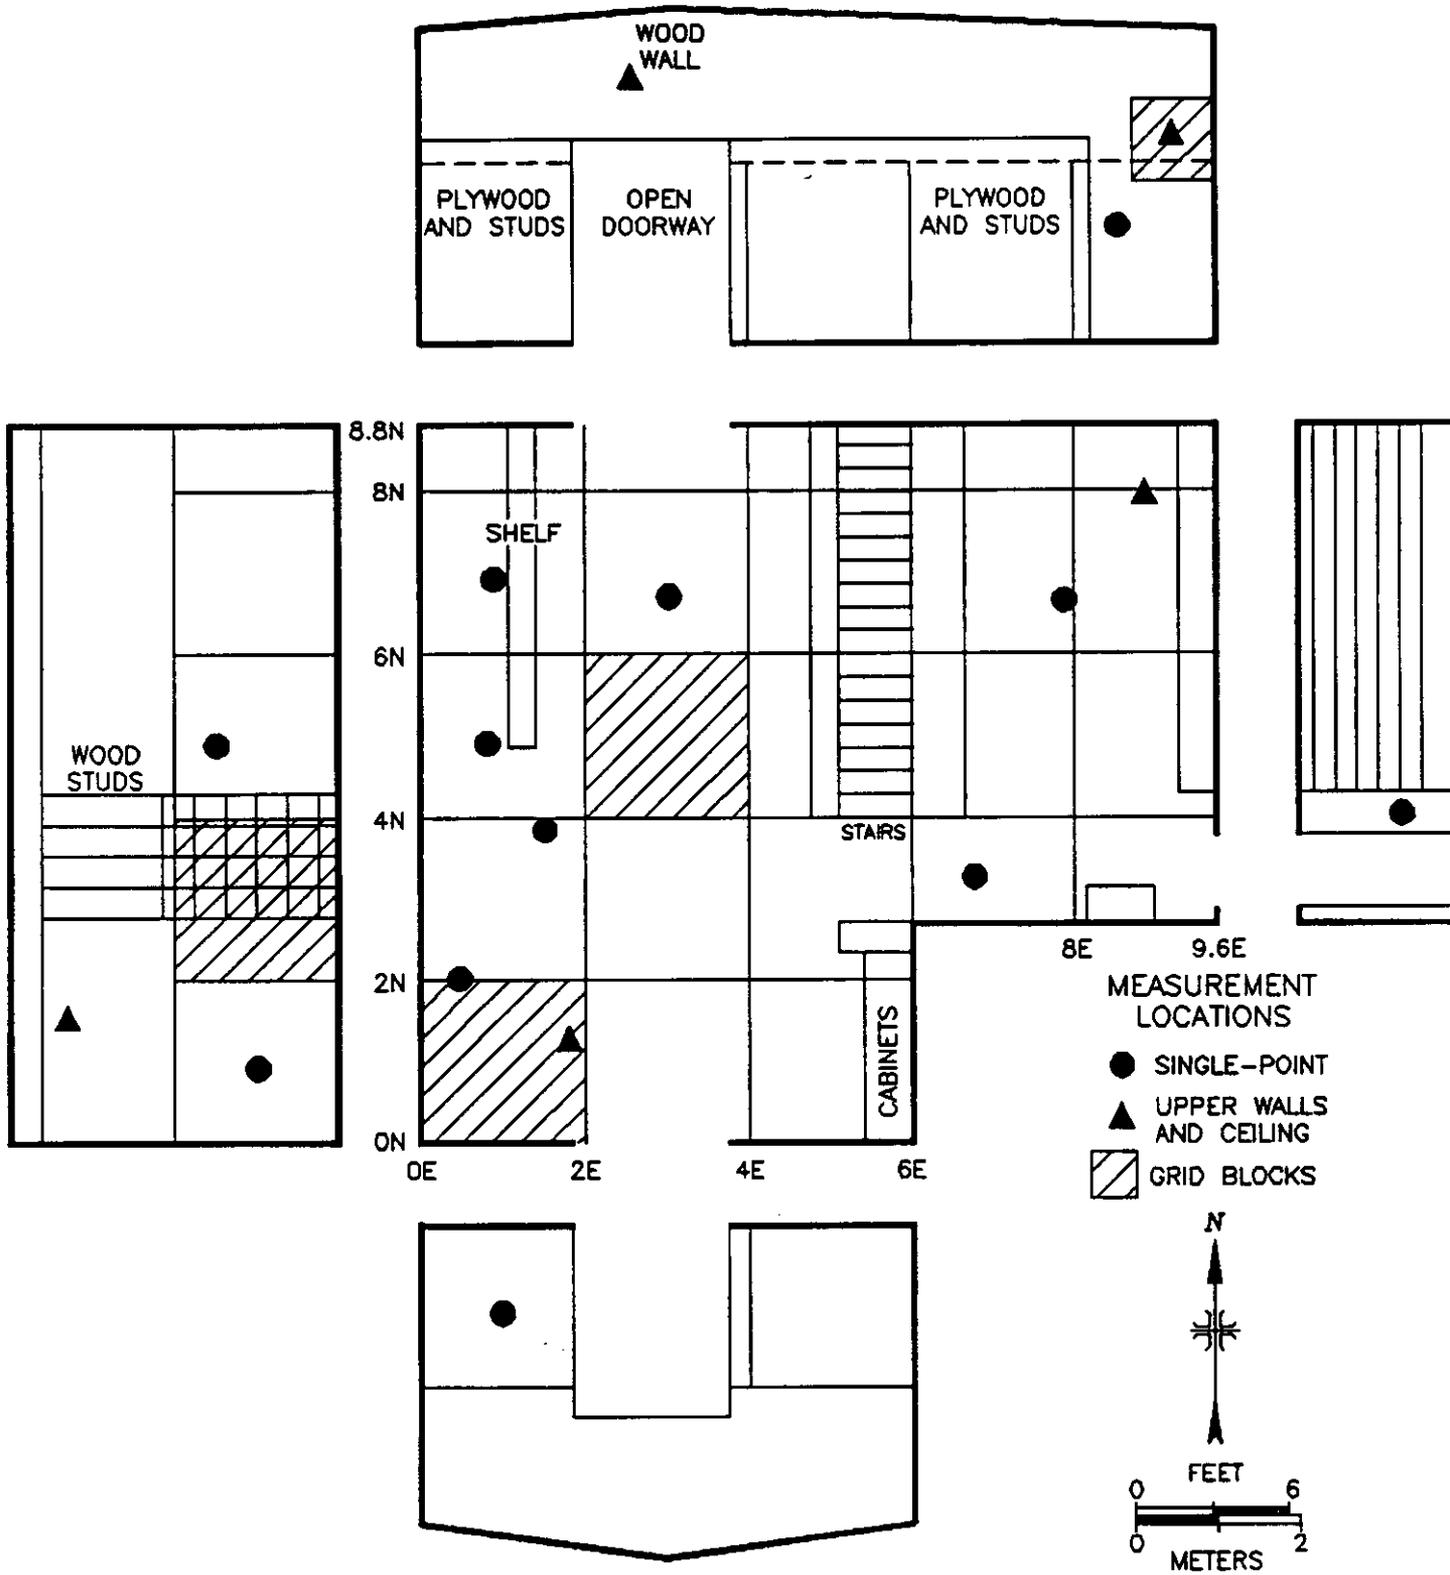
ARC Building 23, Second Floor Storage Area Indicating Measurement Locations
